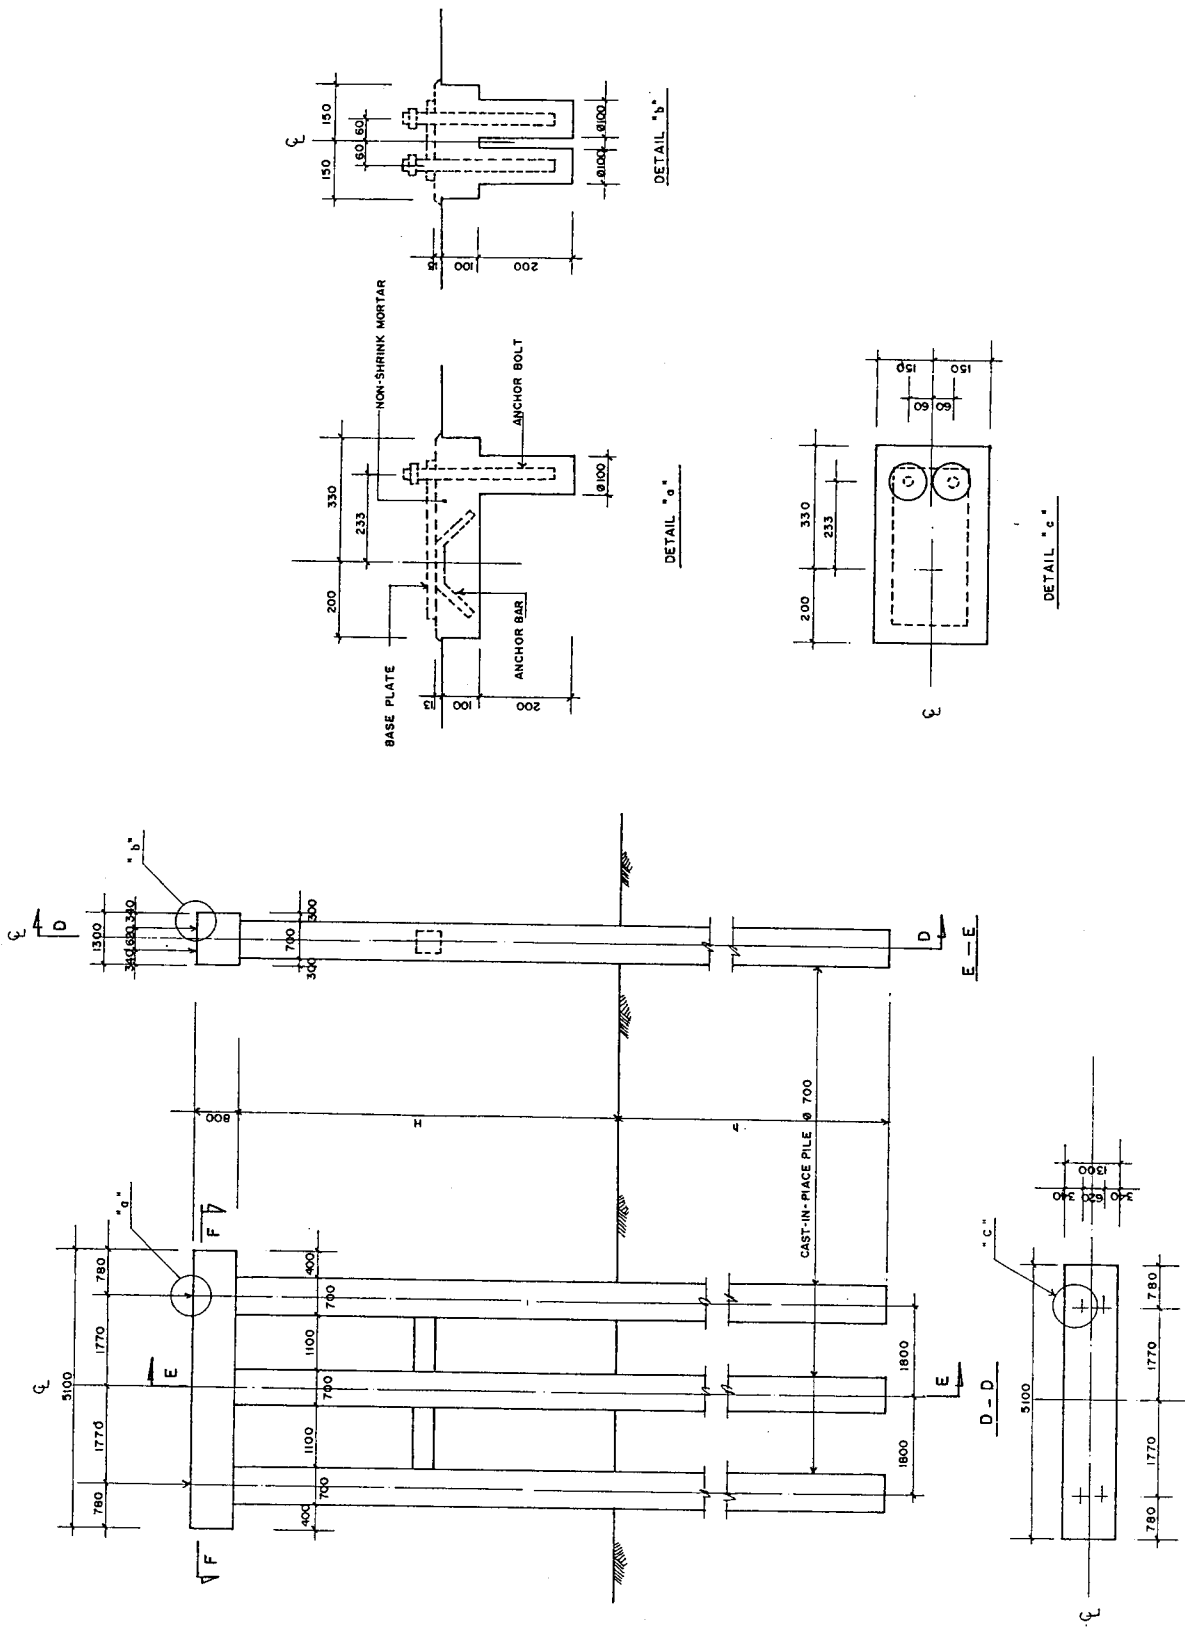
Standard Pile-Bent Pier (Scale : 1:50)
